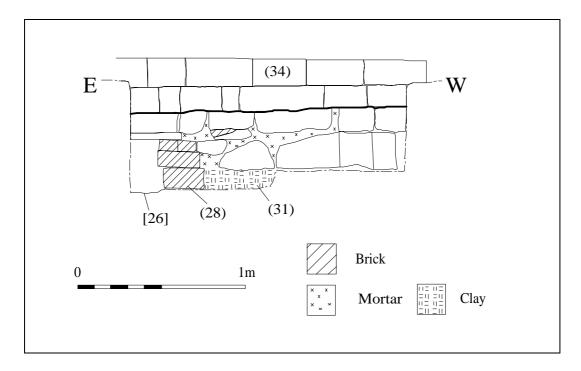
Test pit 4 section and lower courses of polychrome banded wall
